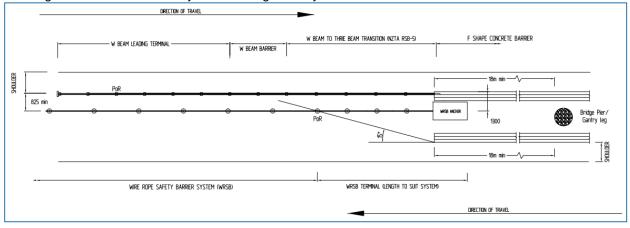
Flexible safety barrier to semi-rigid safety barrier
